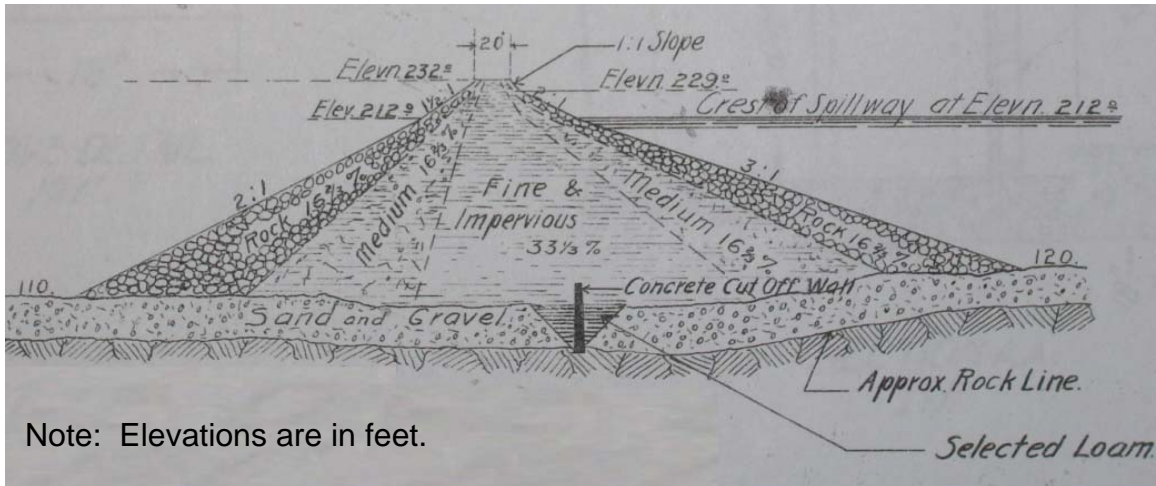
Material Zones and Foundation of the Patillas Dam
